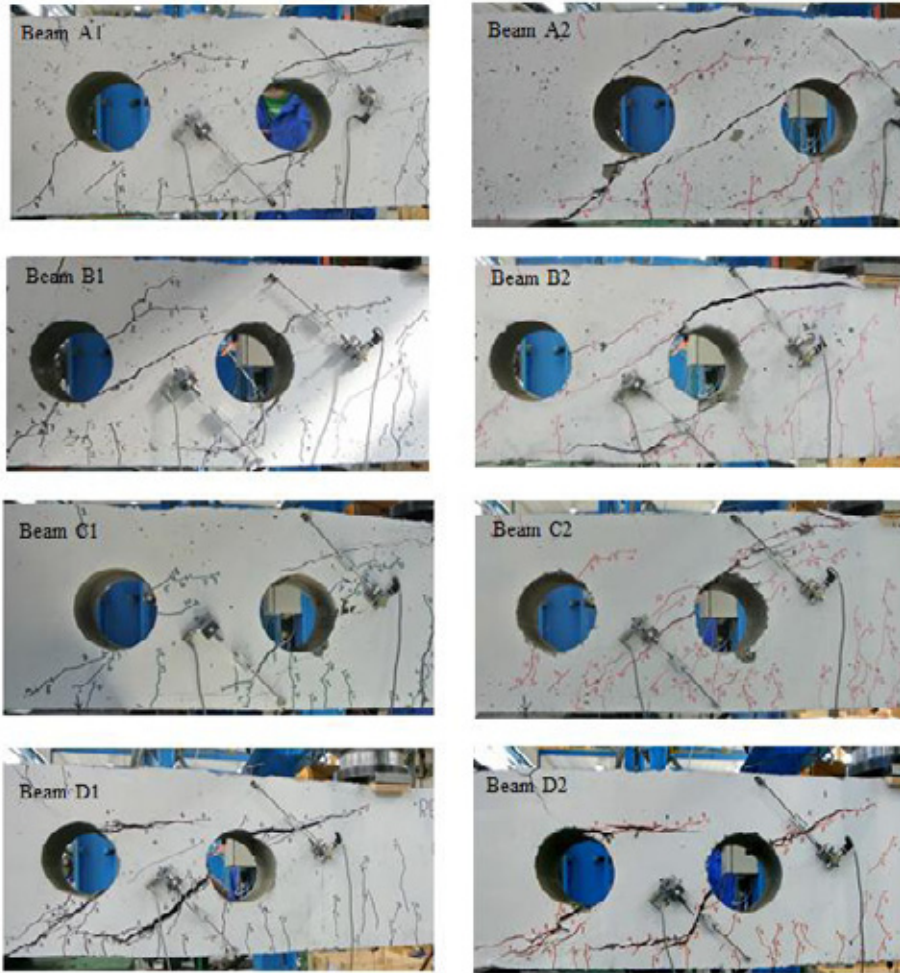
Crack pattern after failure for the four RC beams with double openings.
